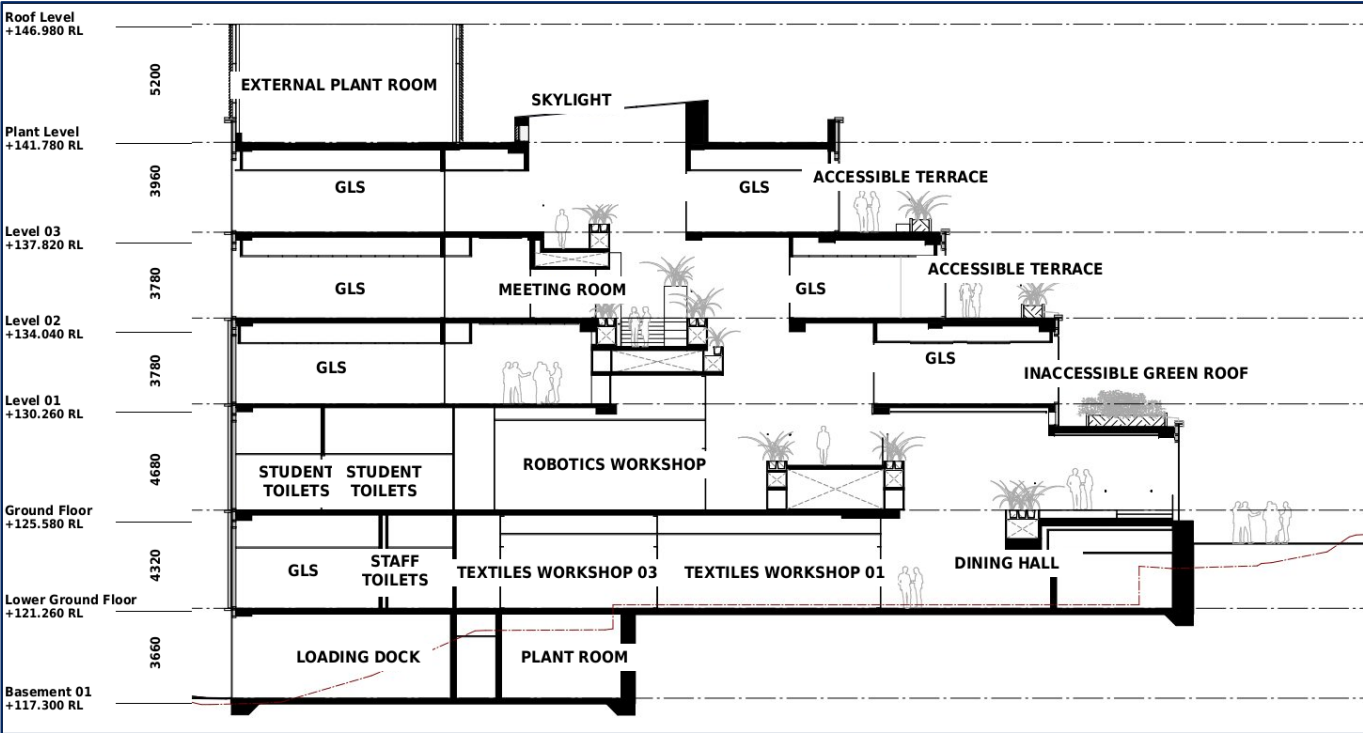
| North-south elevation (Source: Applicant’s EIS 2025)
